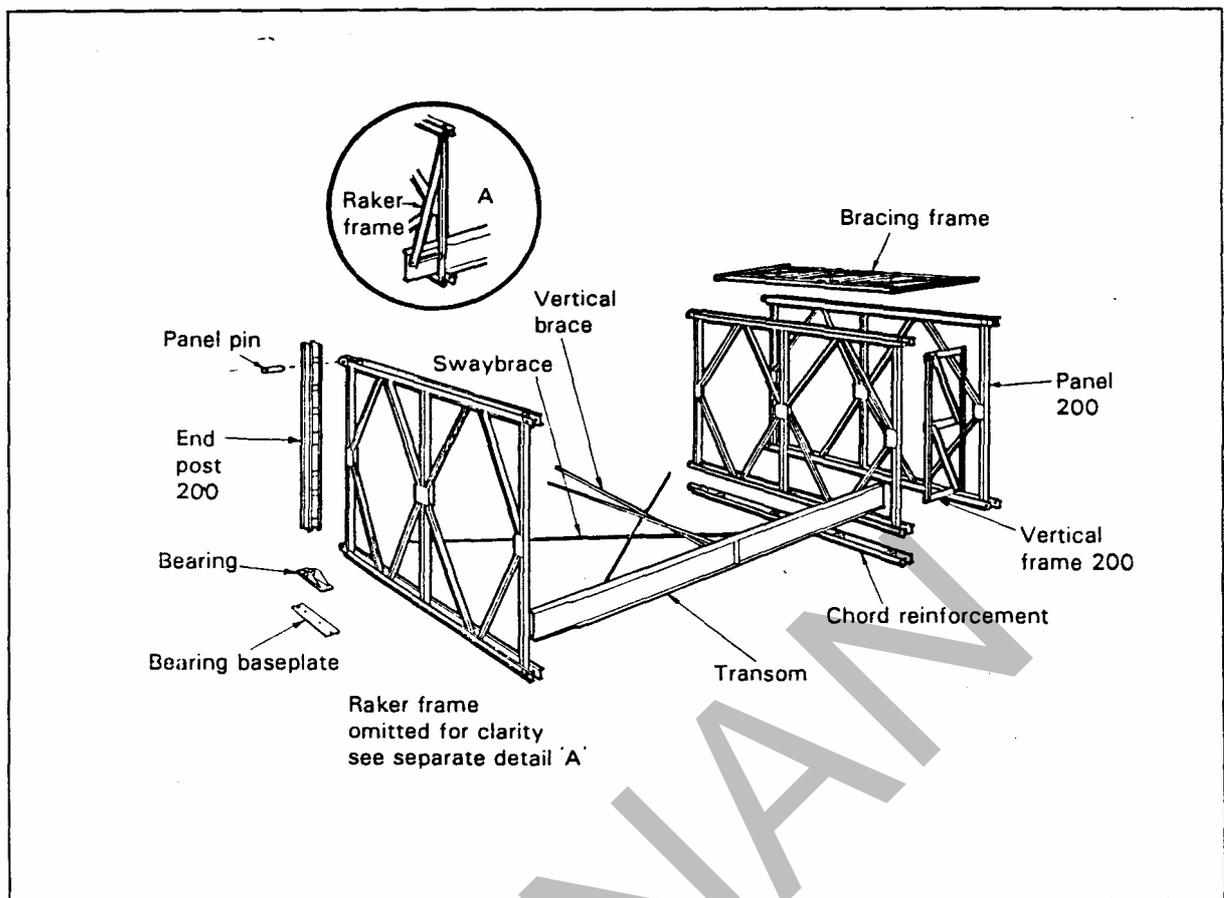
Mabey Johnson Compact 200 Bridging - Typical Cross Section
